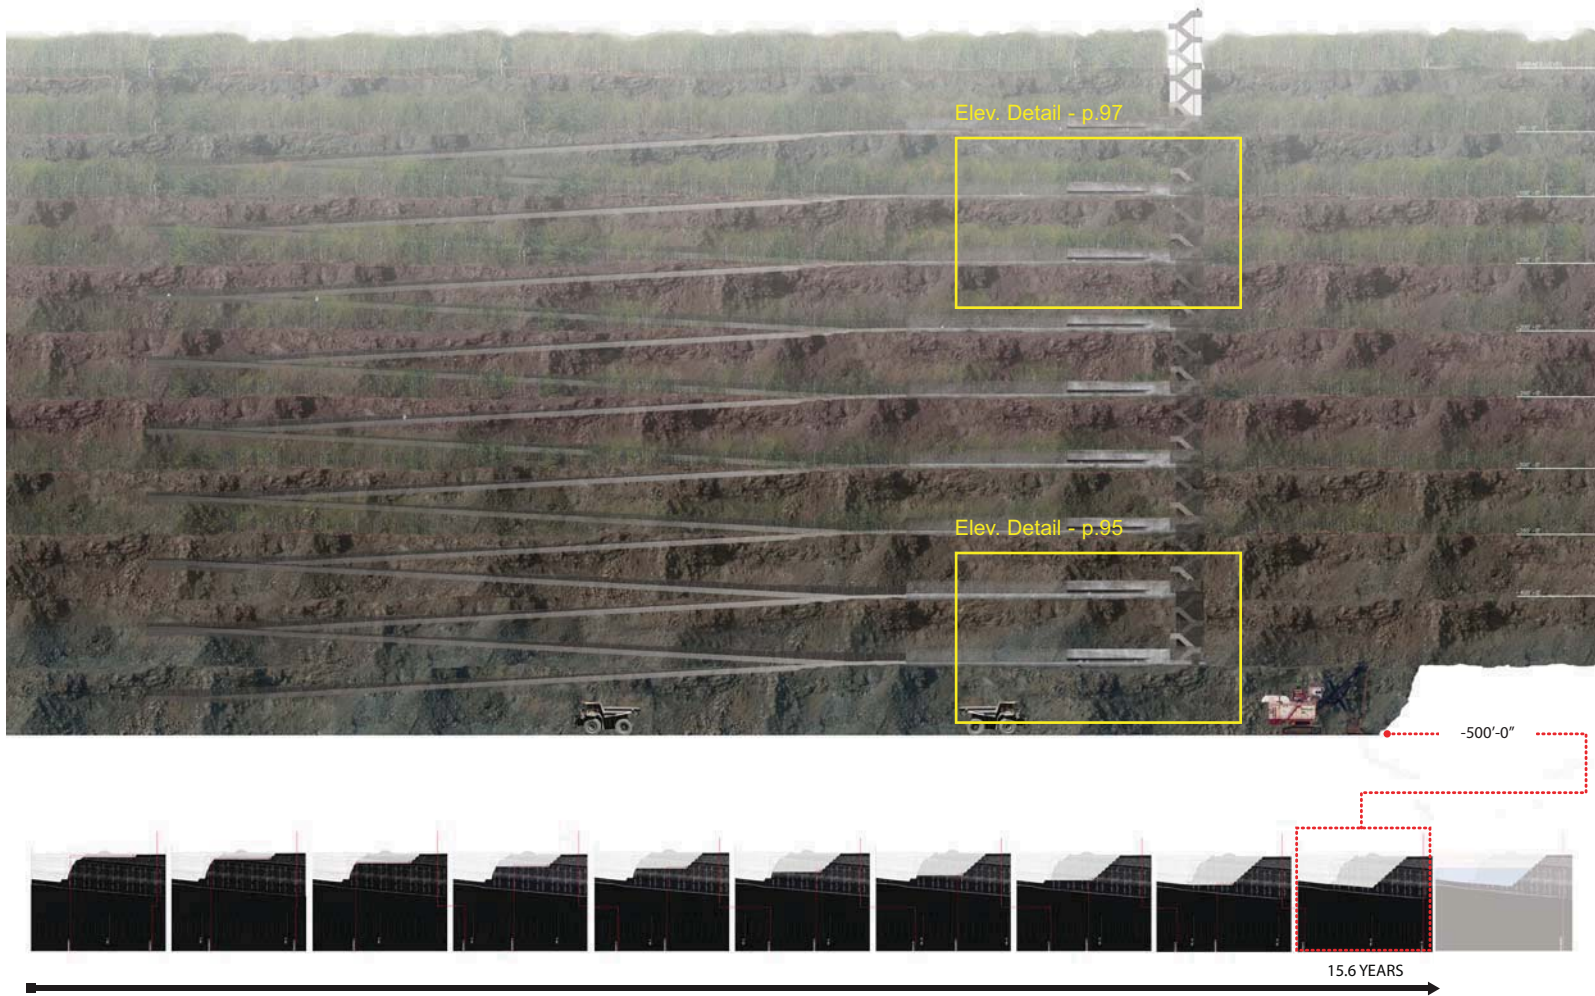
Elevation and Section of Site Change Sequence, Bench 10.
